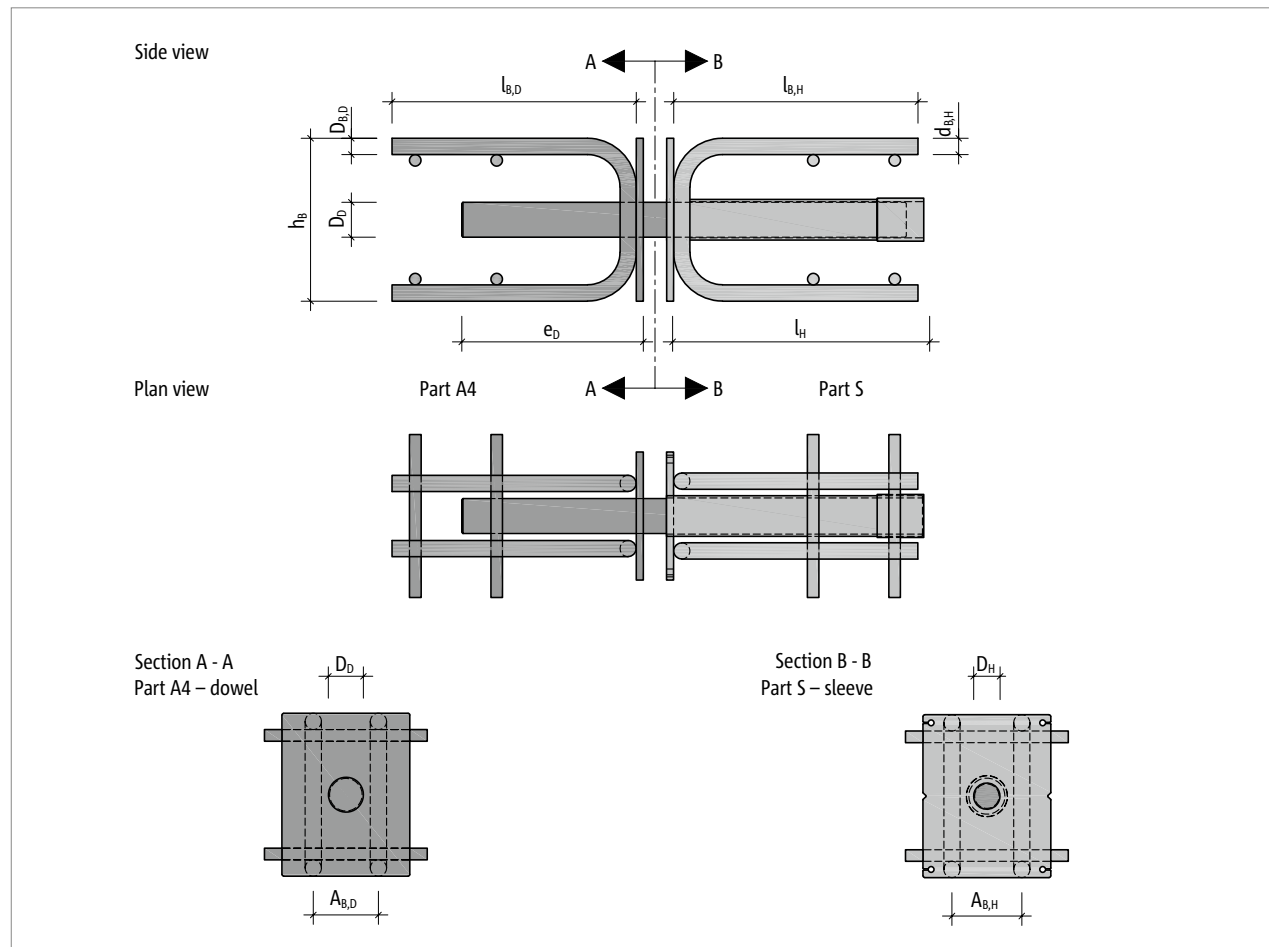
Dimensions Schöck Stacon® type SLD 220 to SLD 450
